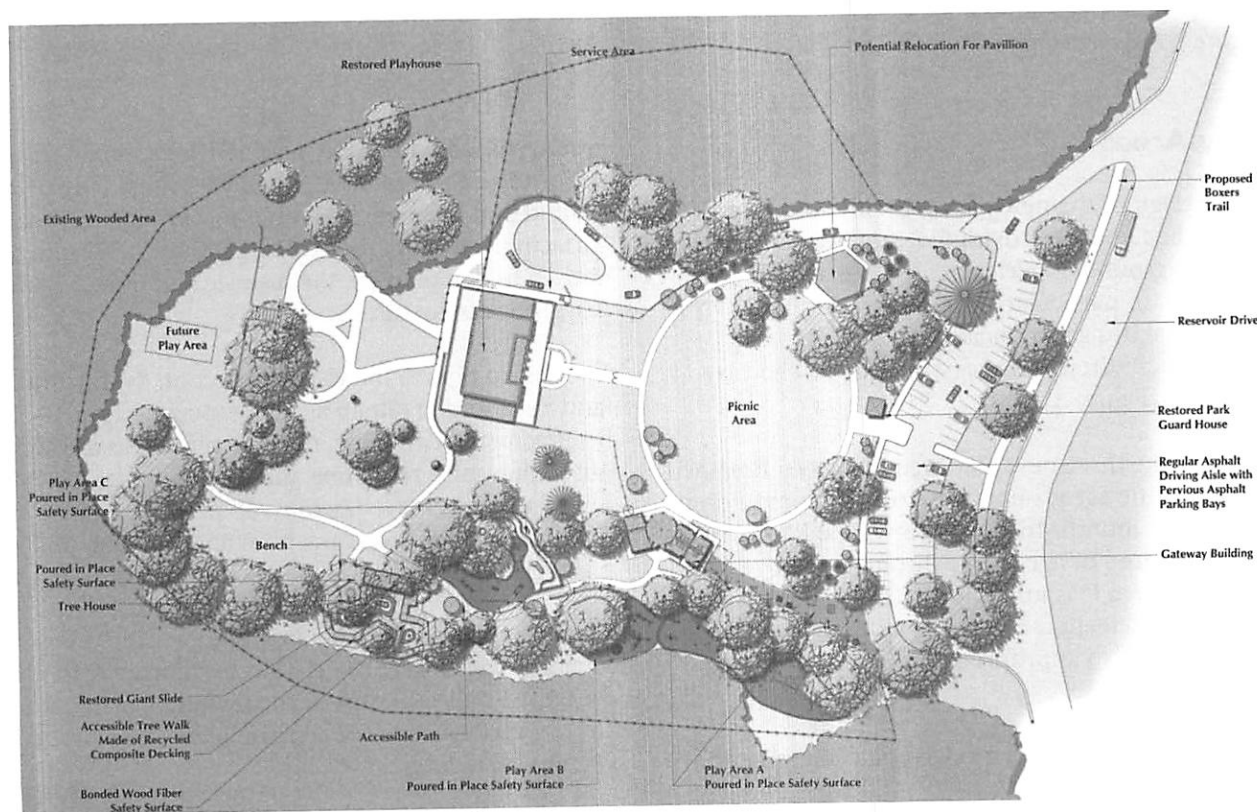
Conceptual Site Plan (Synterra, Ltd.)
